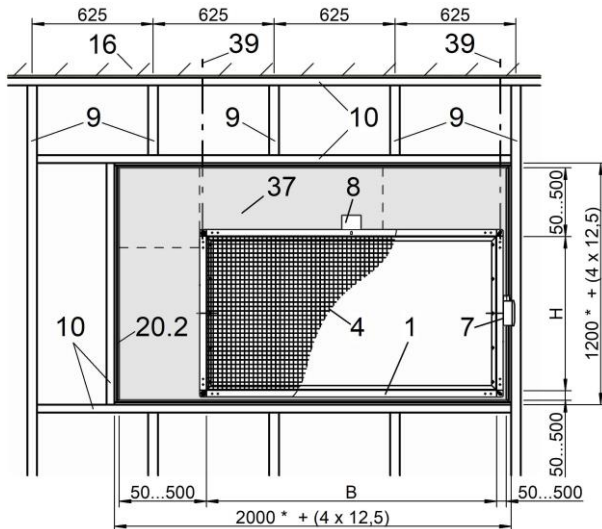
Installation in metal stud wall (wall thickness = 100 mm)
